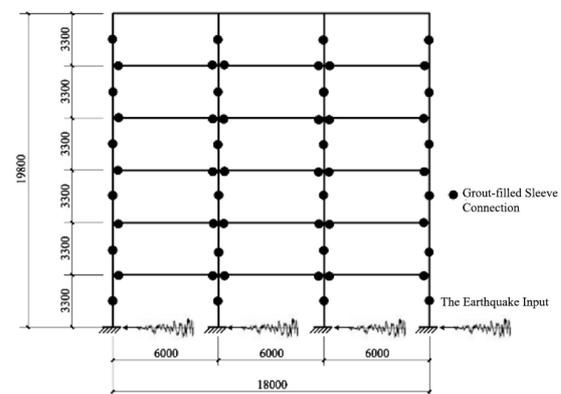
(b) the precast concrete structure KJ-2 with intermediate-connected columns
